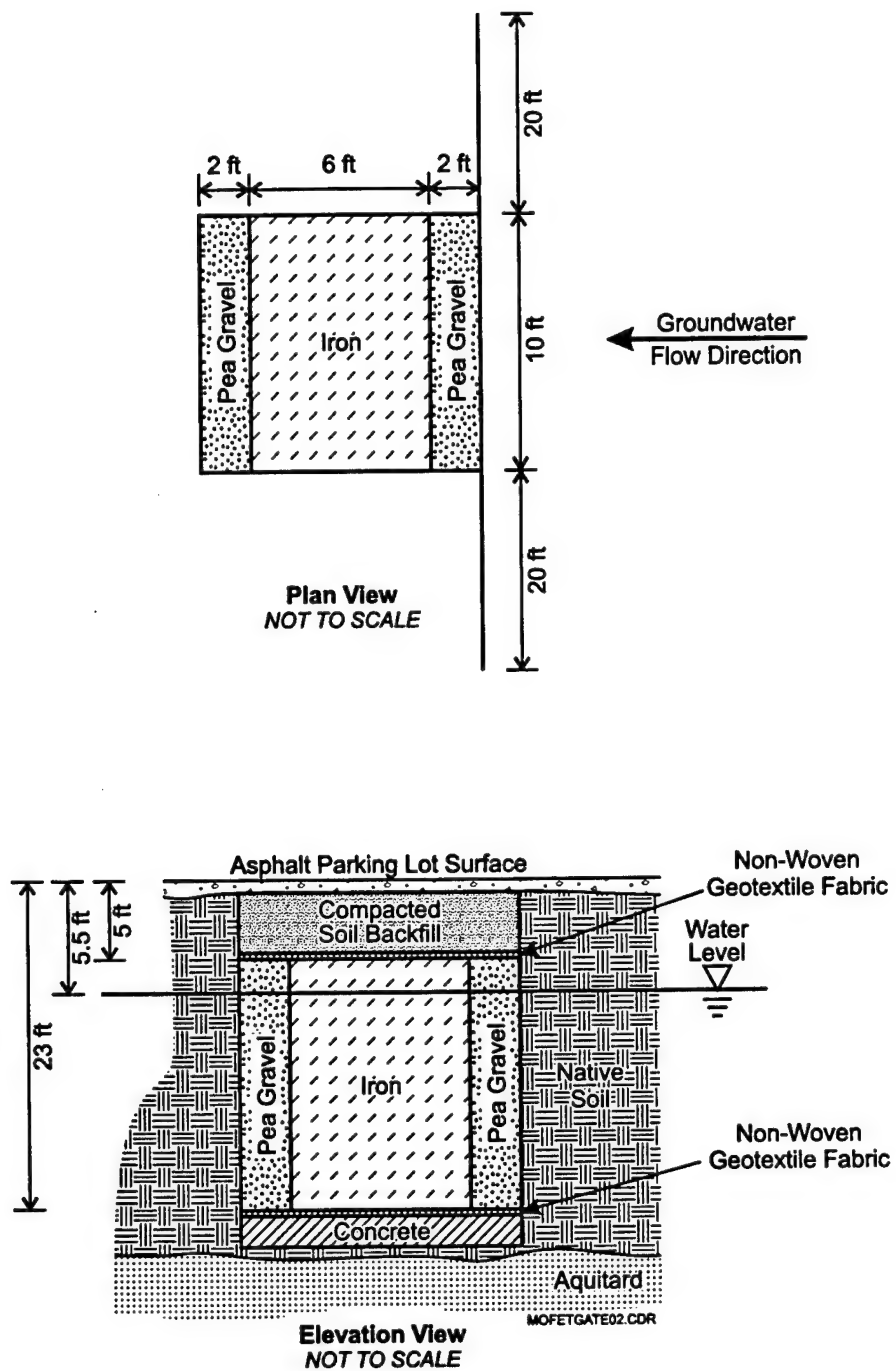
Permeable Reactive Barrier Plan and Elevation View at Moffett Field
